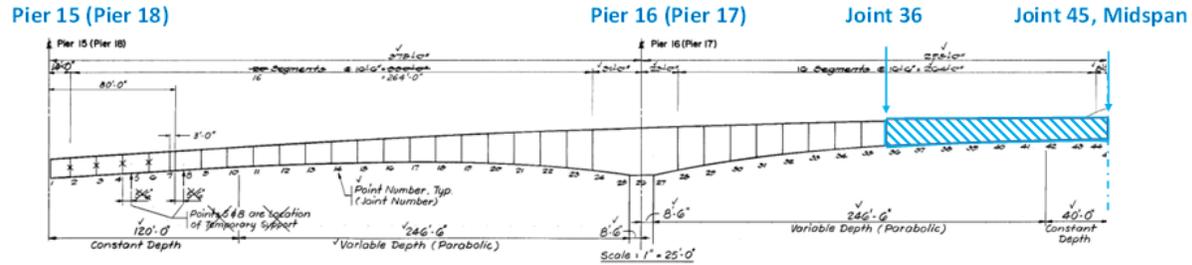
Longitudinal elevation. Pier 15 to the mid-span (the west half).
